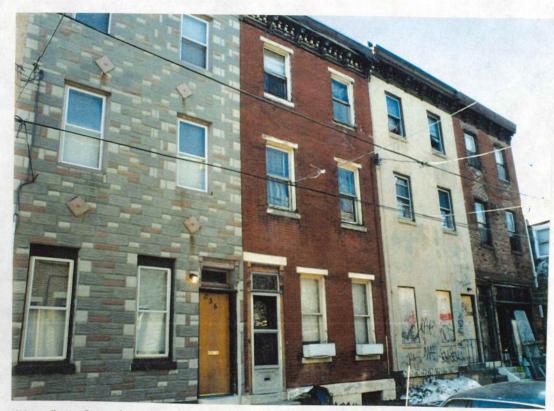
A: Storm door added, converted storefront. C: Deteriorating brick, basement windows broken, windows rotting, paint peeling.
